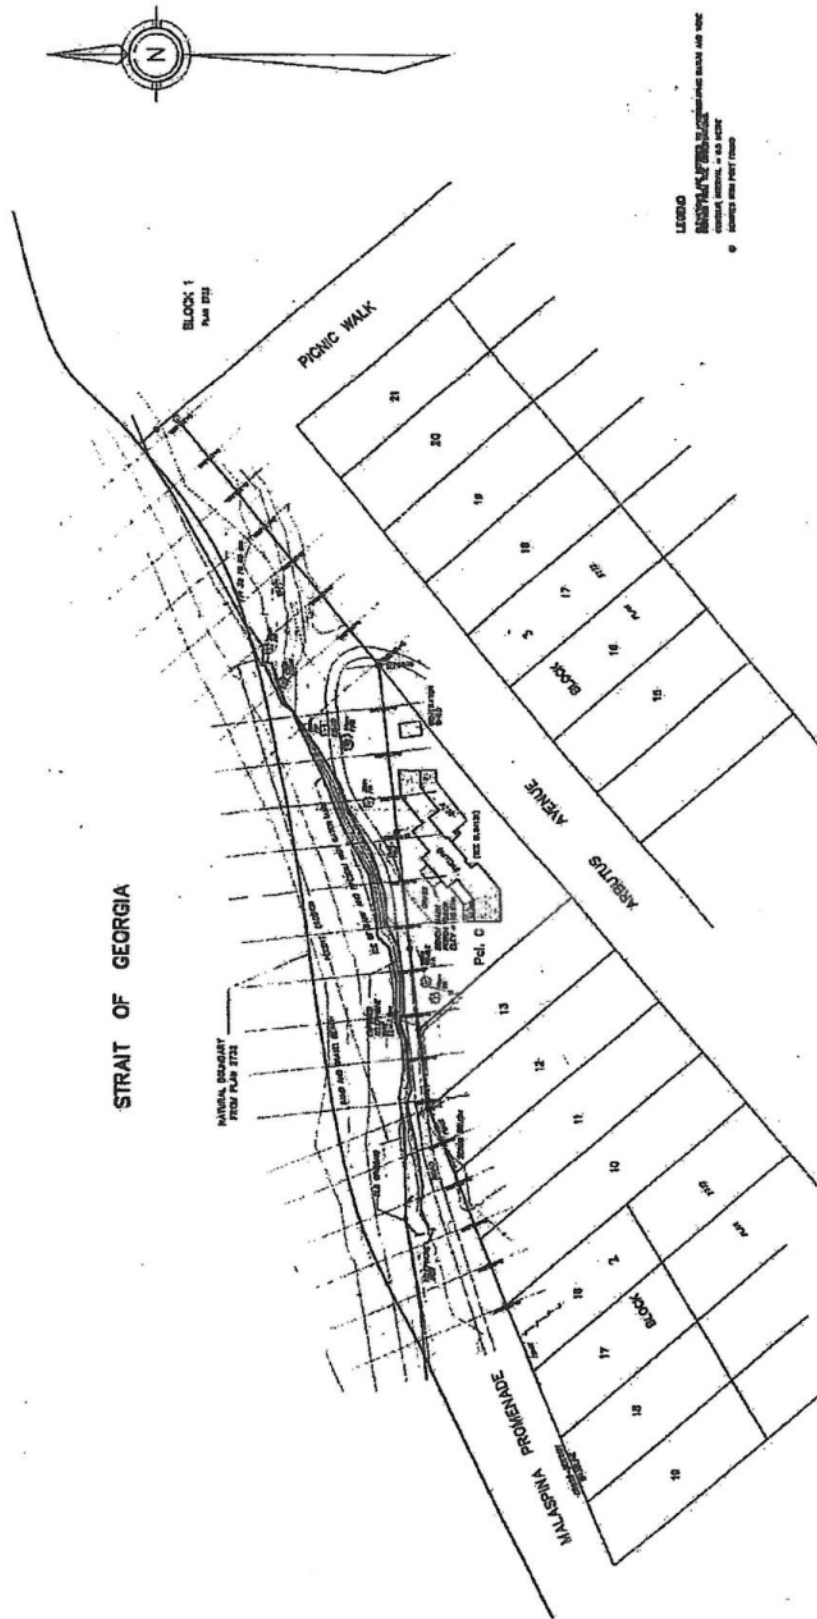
Exhibit C: Site plan of Malaspina Promenade prior to the stone retaining wall being built.
